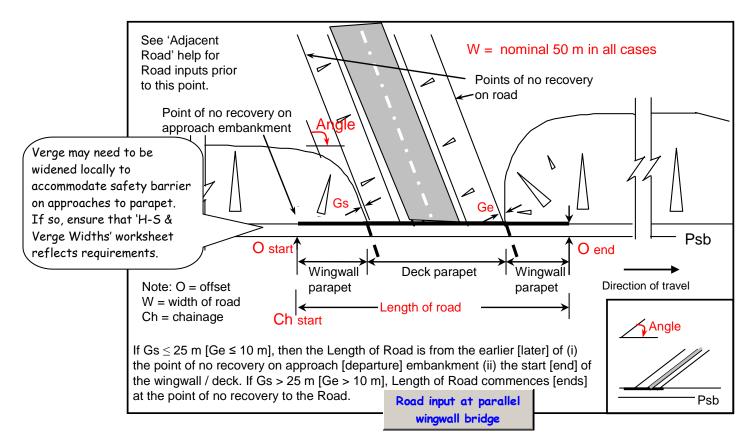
(e) Road crossing under Road at structure with parallel wingwalls
